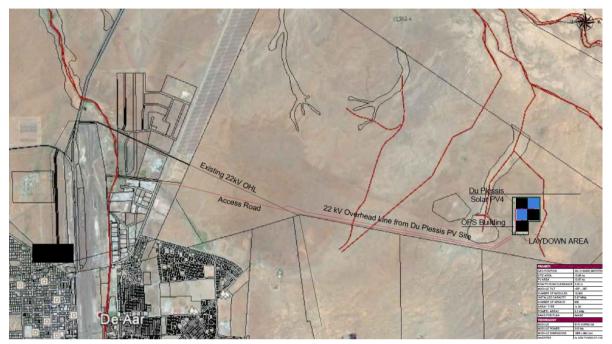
Proposed layout - Du Plessis Solar PV4 facility
